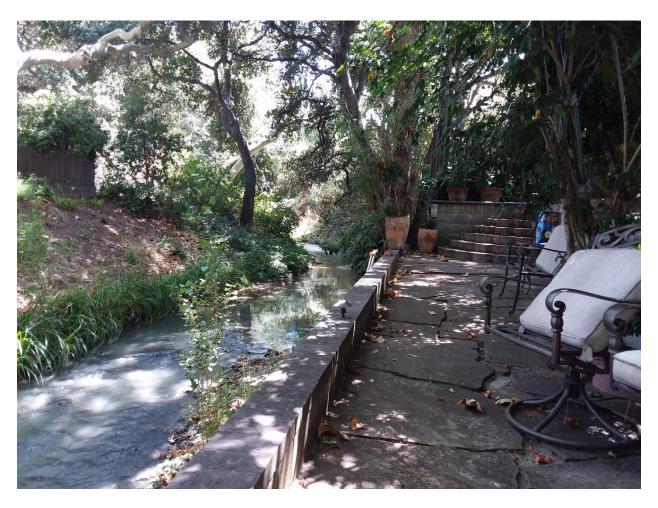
Looking Upstream. The stone patio and lower retaining wall are proposed to be removed and the original contours of the bank restored with native riparian vegetation planted along the bank. Stevens Creek is visible in the left side of the photo.
